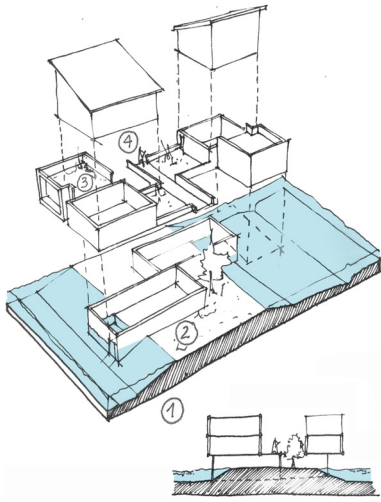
Flood Resistant House. (1) Site: Temporarily flooded; (2) Structure: Traditional structure with engineered brick foundation; (3) Skin: Pervious open spaces; (4) Program: Elevated pathway.
